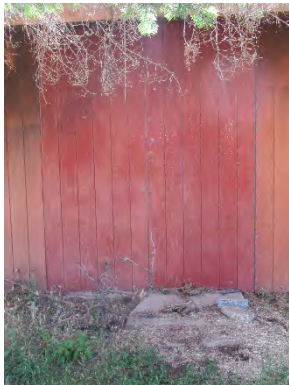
Boarded up door on eastern elevation. Photograph taken 6/25/2019.
